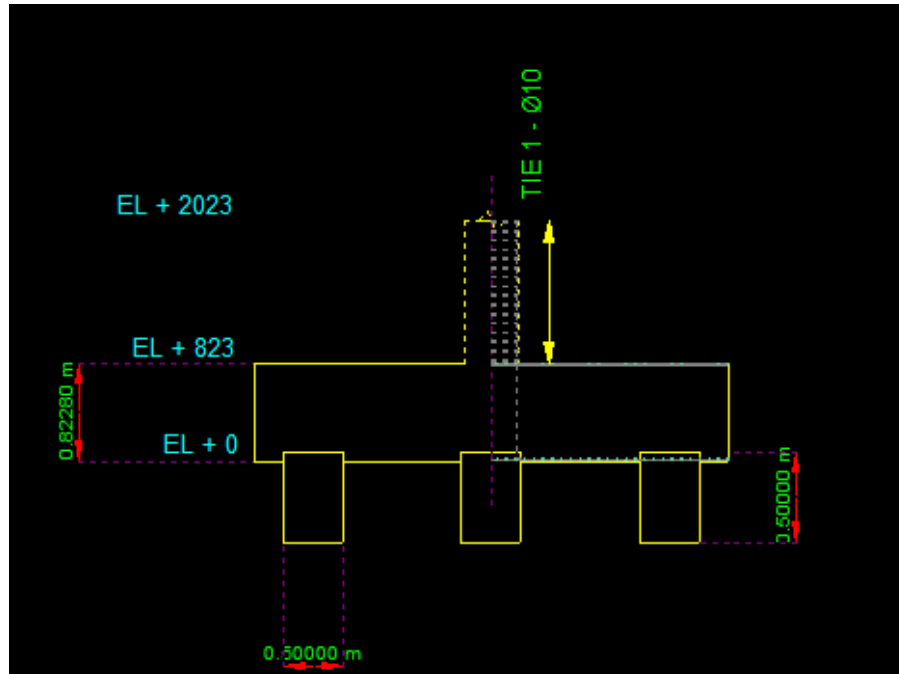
Section of pile group in STAAD.FOUNDATION
